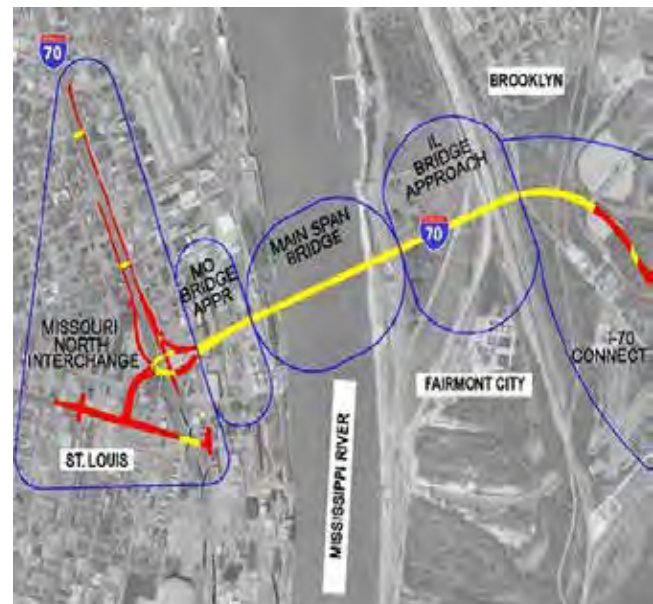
New Mississippi River bridge layout (Horn 2010).
